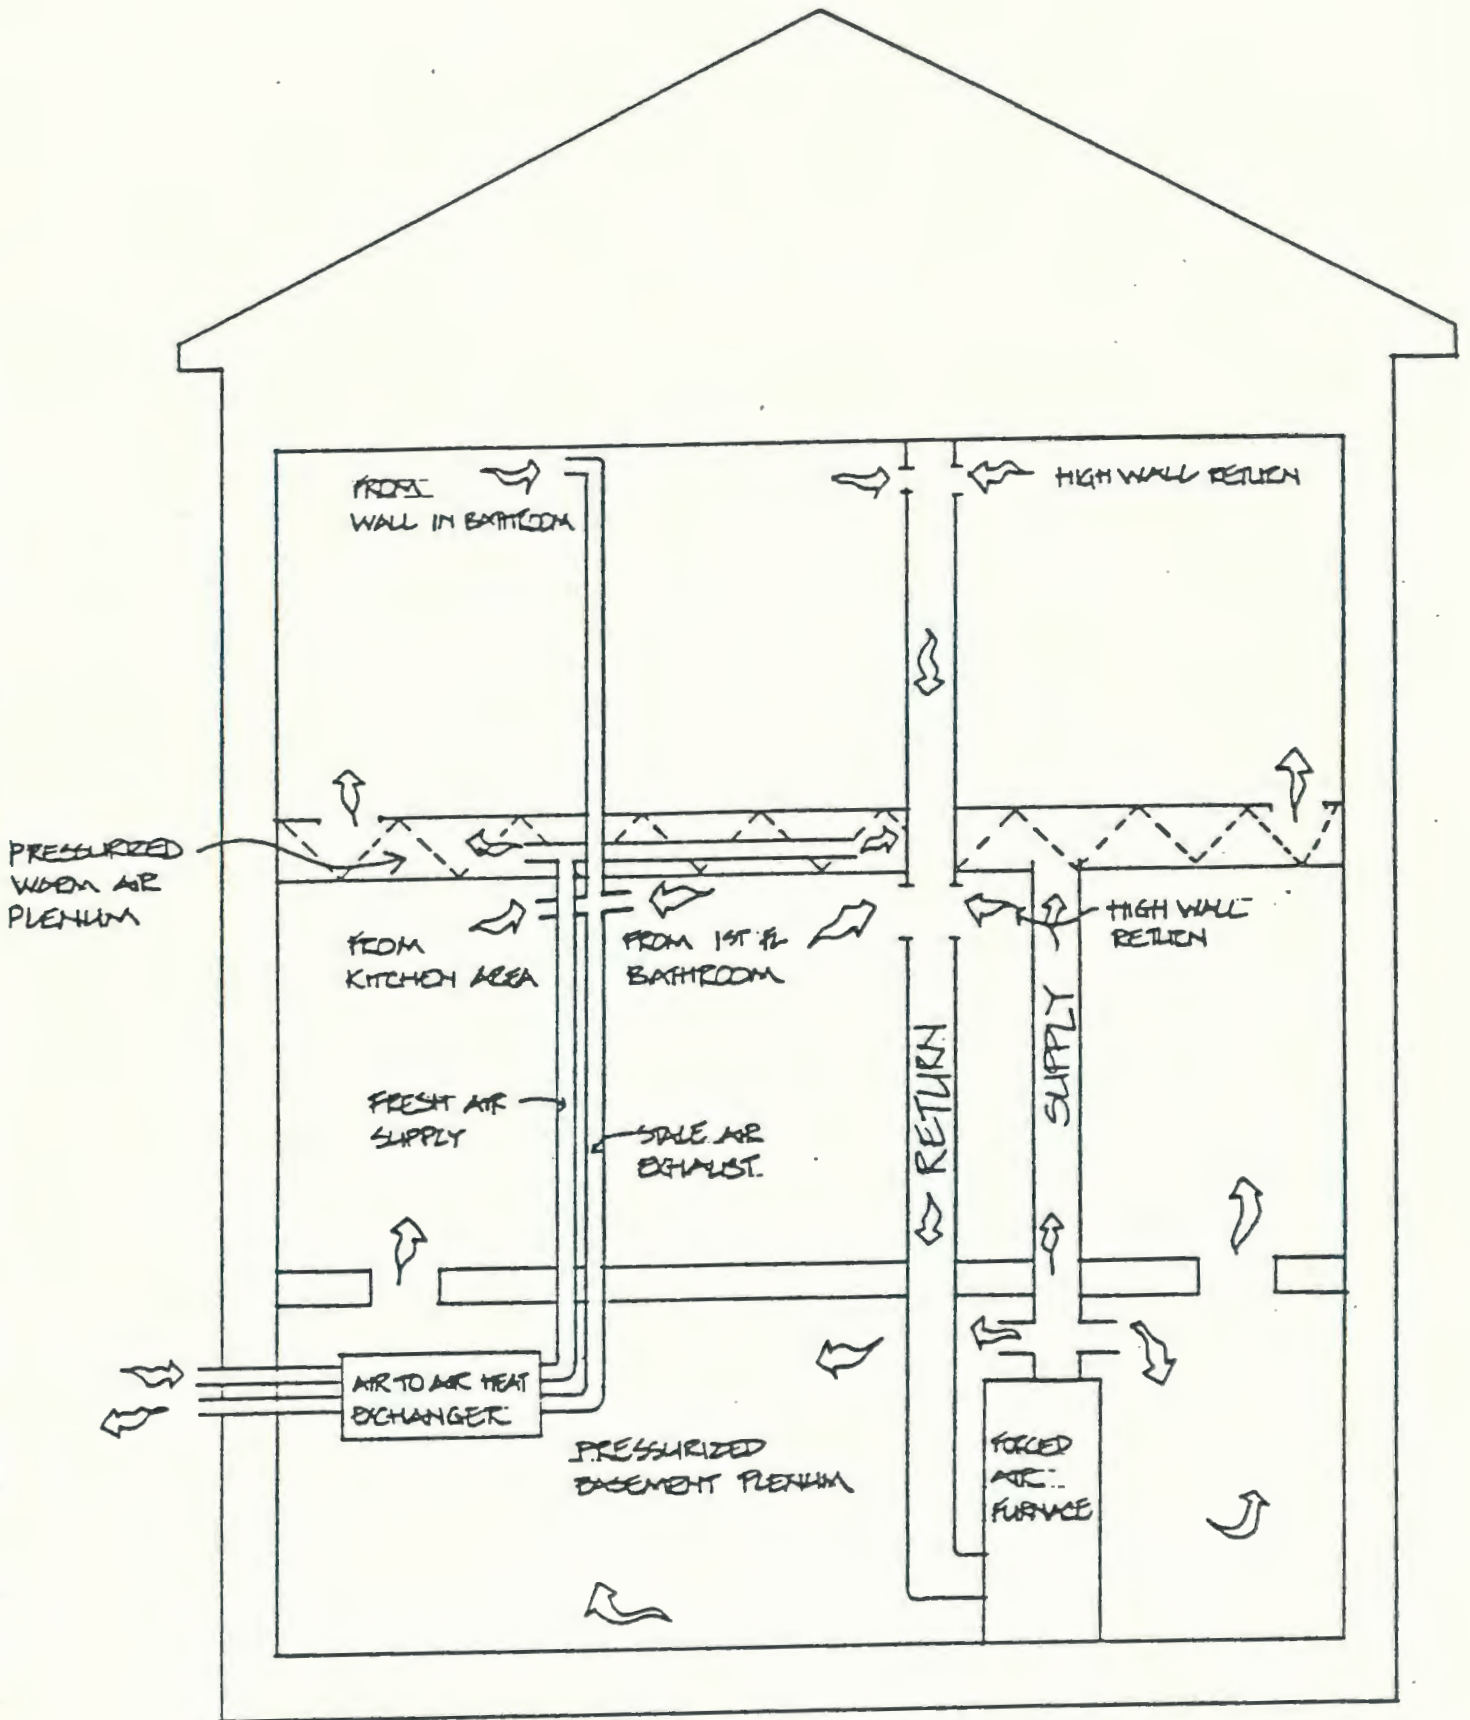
Heating and Ventilating Schematic - Alberta Demonstration Project
